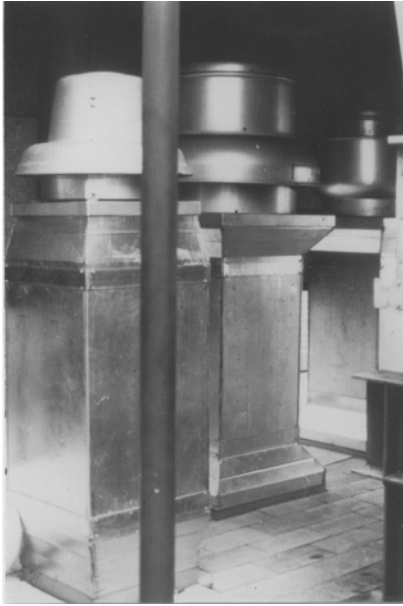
Power roof ventilators (mushroom fans) mounted on intake duct silencers and roof curbs.
